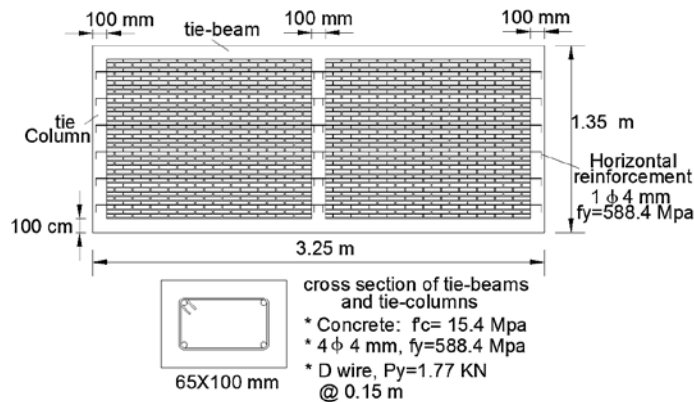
Reinforcing details and dimensions of infill wall corresponding to the six story buildings
